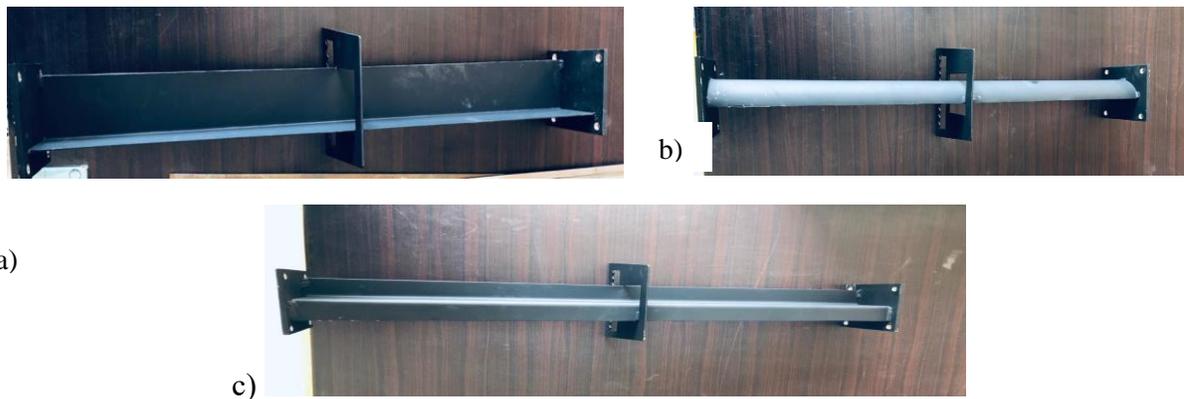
cross sections used in experiment, a. L-cross section, b. semi-circular cross section, and c. Z-cross section
